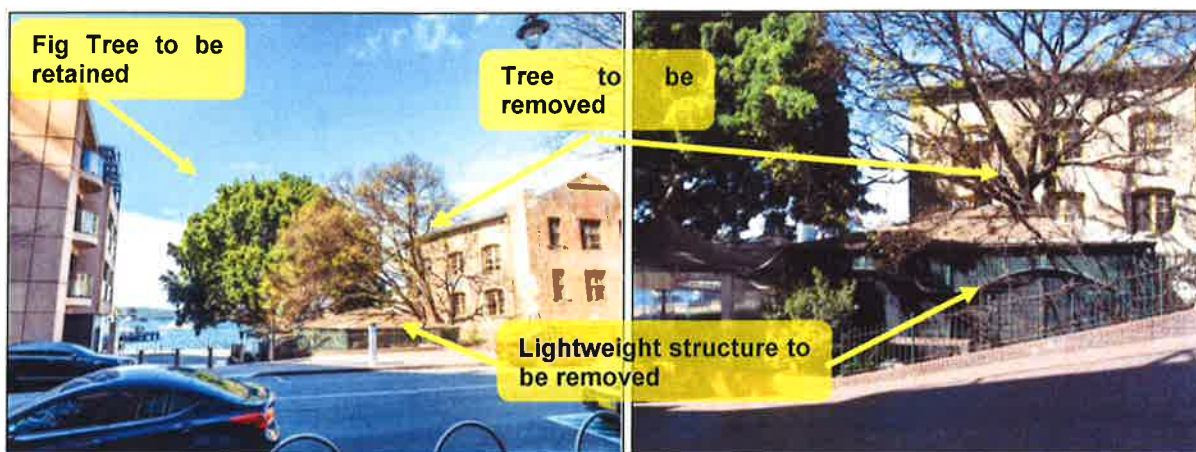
The existing lightweight structure and tree at Bay 12 proposed to be removed and fig tree to be retained (Source: Applicant's EIS).
